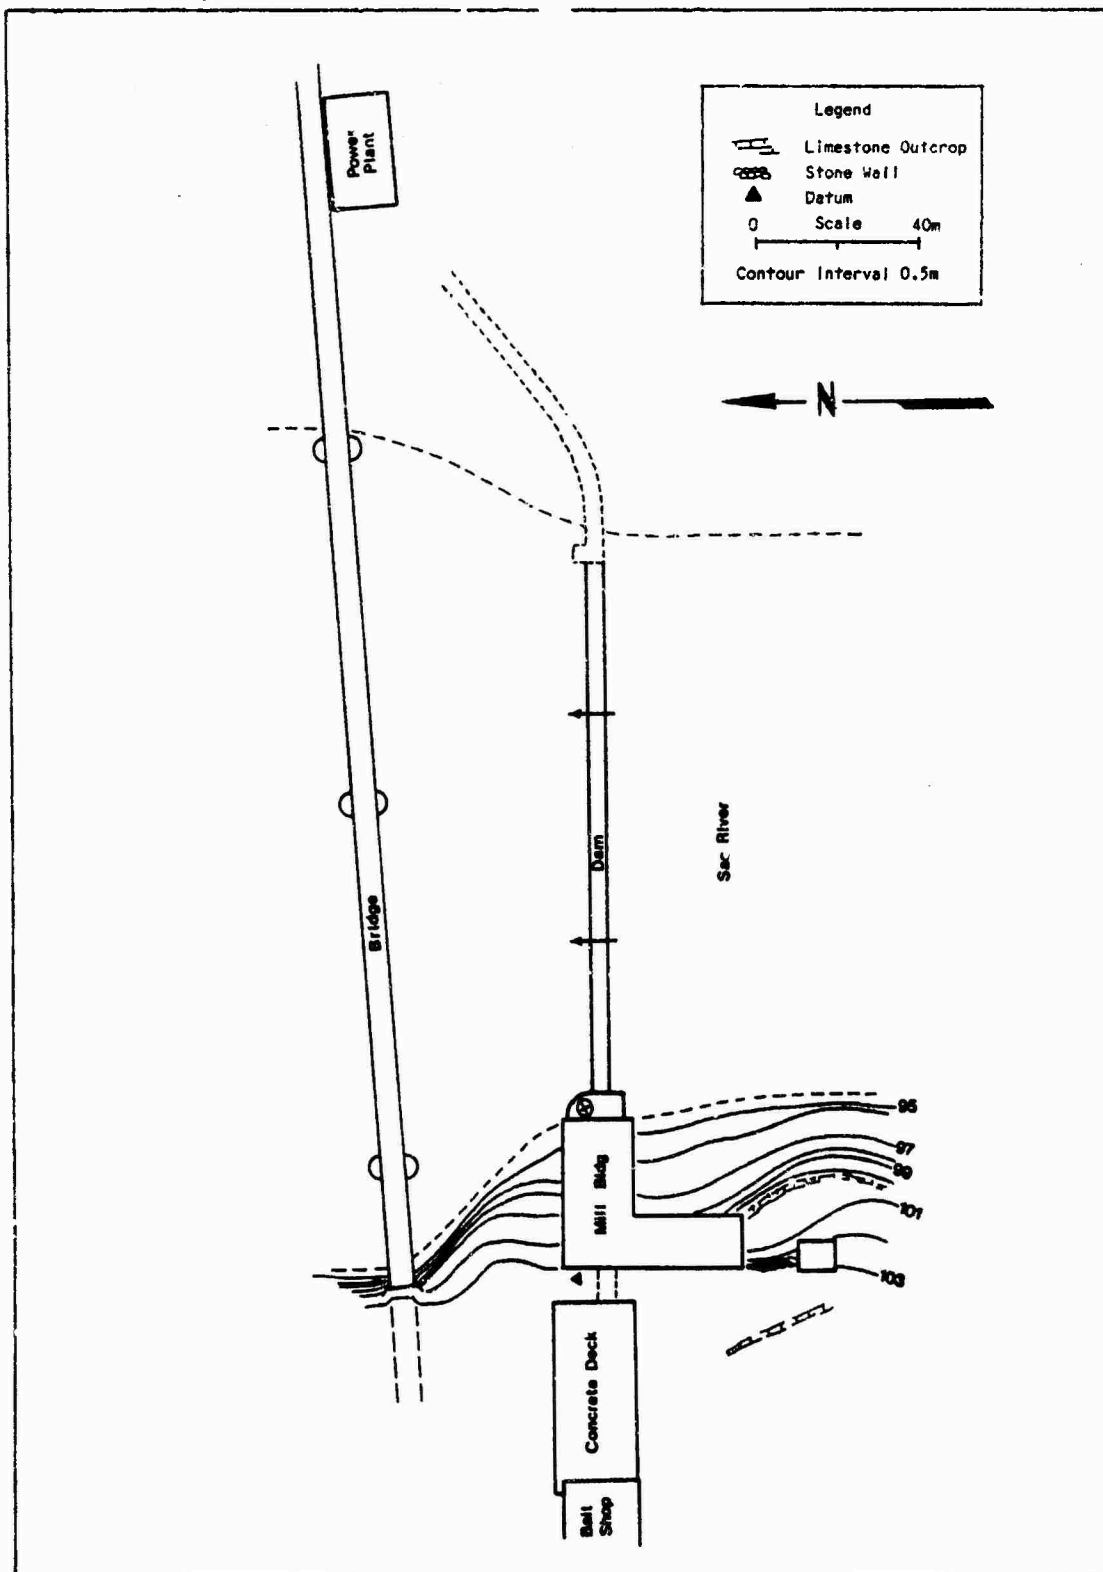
Site Plan, 23CE400 (Caplinger Mill)
